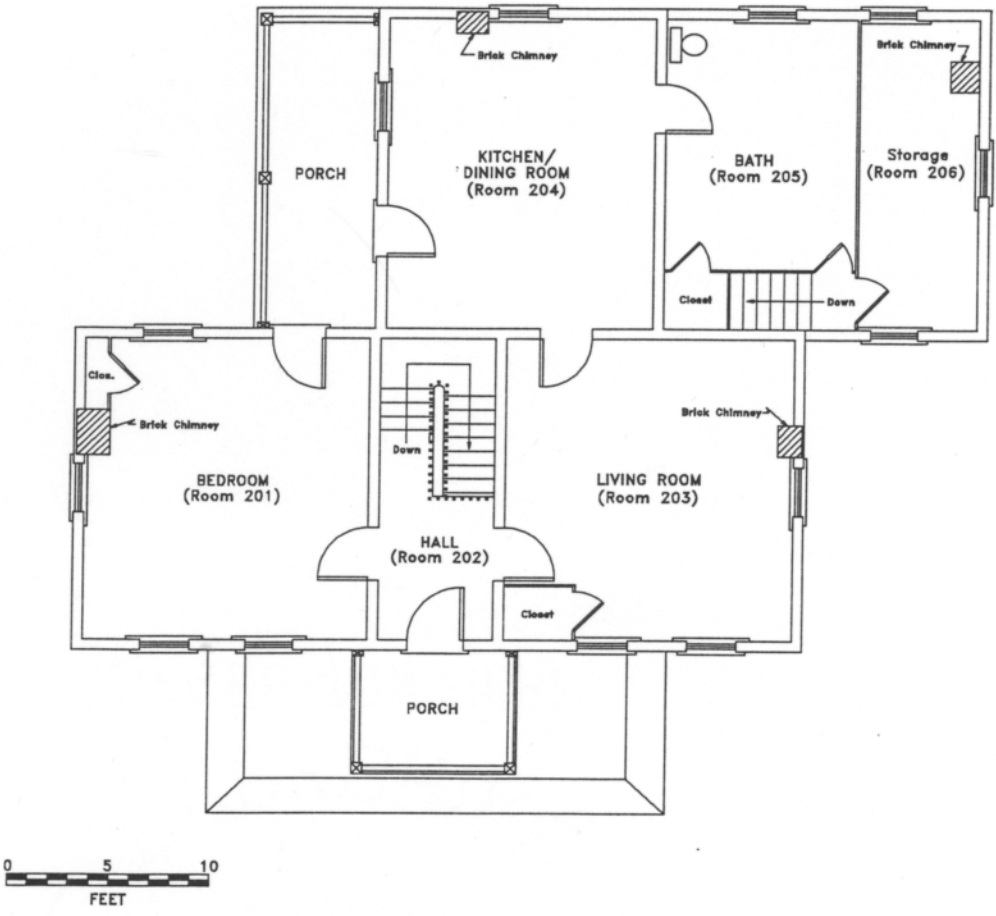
Second floor plan of the Williamson House, showing recent modifications, 1995.
